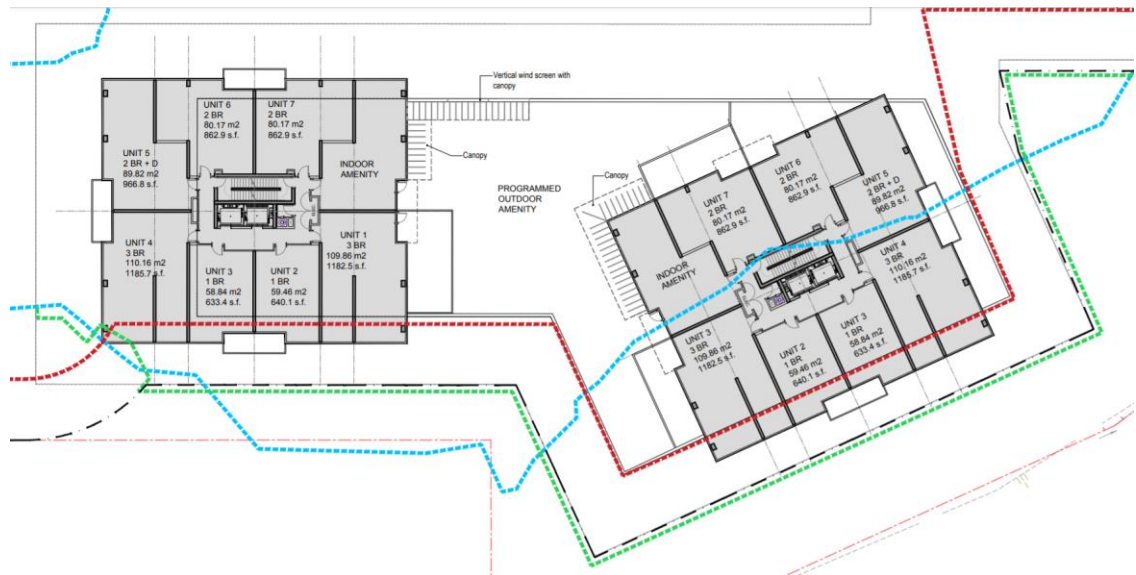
Proposed Third Floor Plan, Prepared by IBI Group
